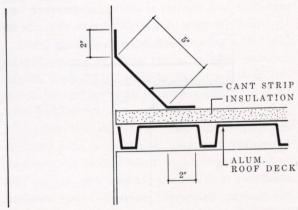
Typical flashing accessories used in application of aluminum roof deck. Concluded from Page 199.
